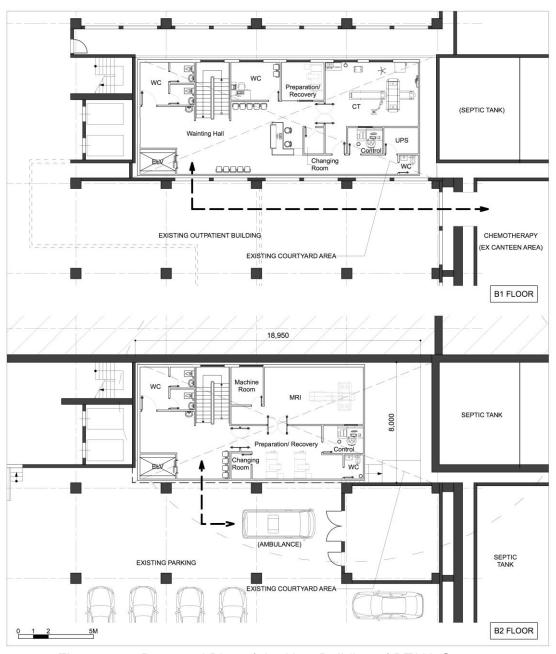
Proposed Plan of the New Building of RTAH, S=1:250
